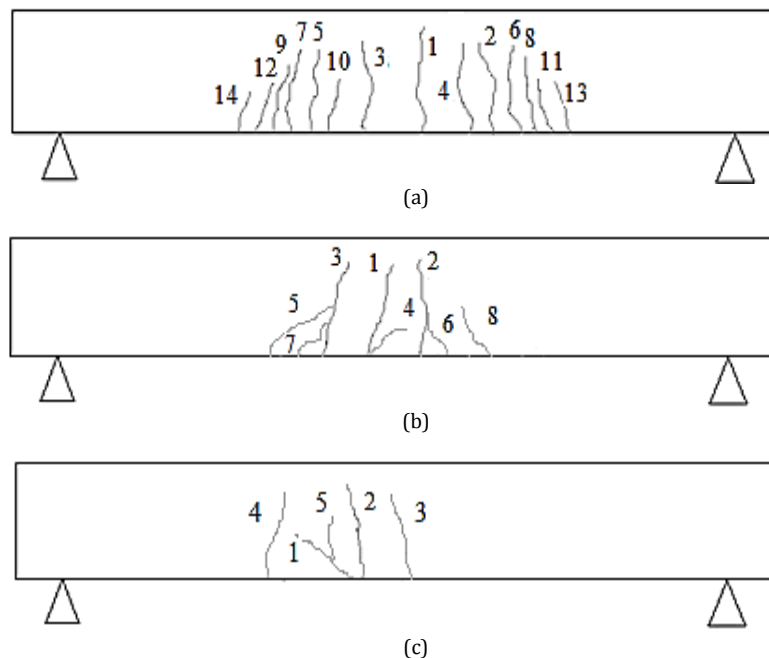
Crack propagation: a) Control beam specimen, b) Beam specimen strengthened with non-prestressed CFRP laminates, c) Beam specimen strengthened with prestressed CFRP laminates
